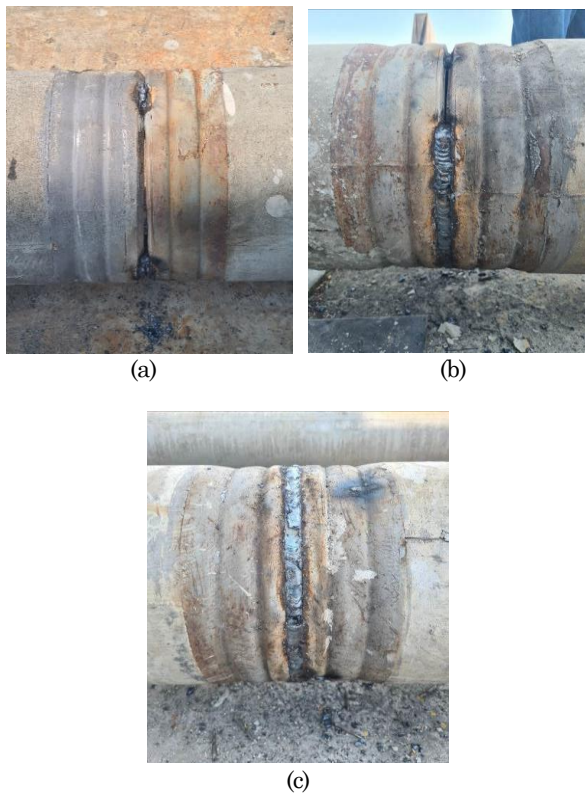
Spun Pile Connection with Gap (a) Welding at Four Points; (b) Welding at Half Circle; (c) Full Welding
